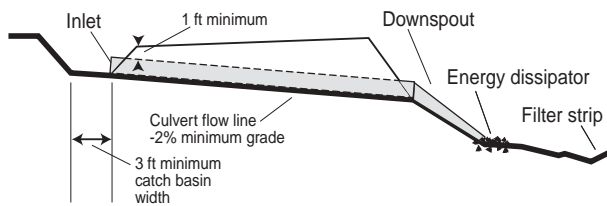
Minimum dimensions for ditch relief culvert installation.
